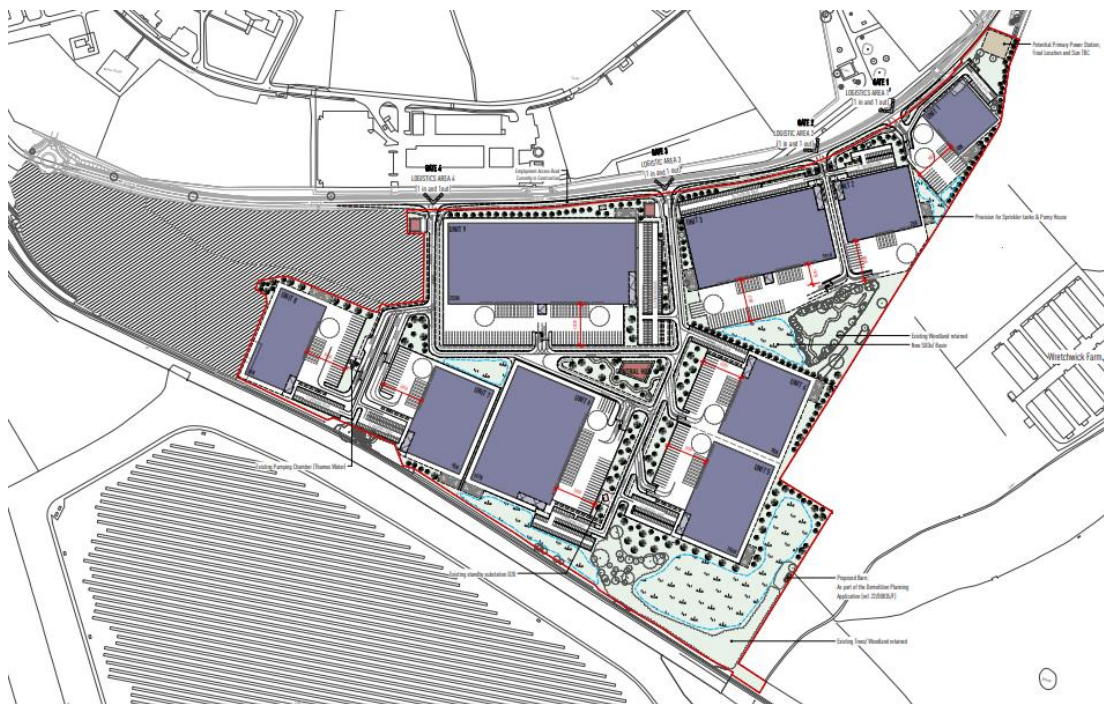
Indicative Masterplan Layout (for Assessment Purposes Only, not to be fixed)
